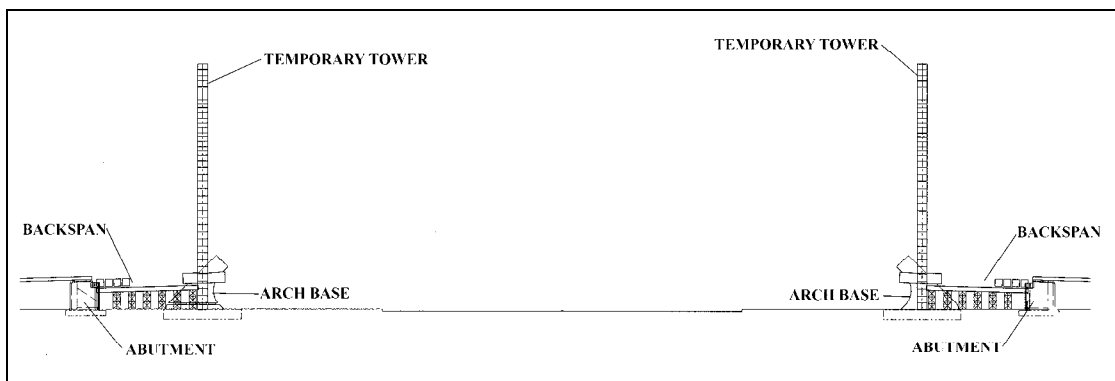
Step 1-Construct Approach Spans (Modified IRIB Specifications and Construction Plans)
